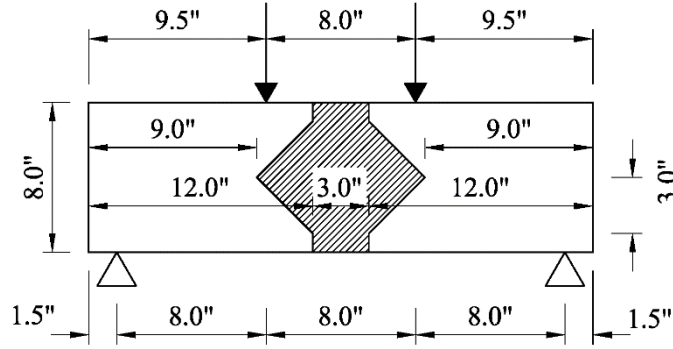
Details of test specimens for ASTM C78 with notched joint
